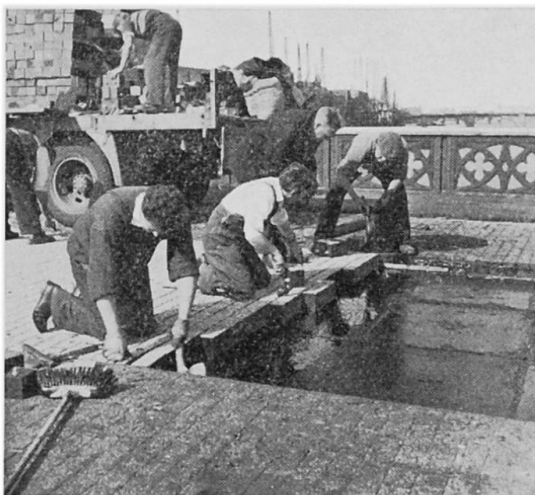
Laying wood blocks which have been previously coated with an epoxy-resin-based surfacing; Tower Bridge, London, 1962.
